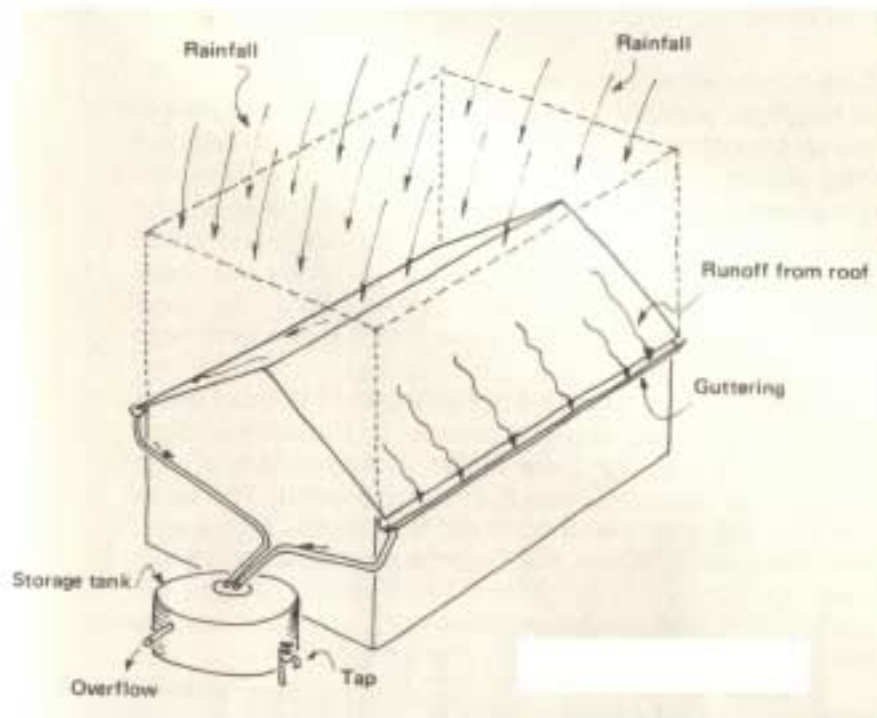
Arrangement of roof catchment tank (from Watt 1978)
